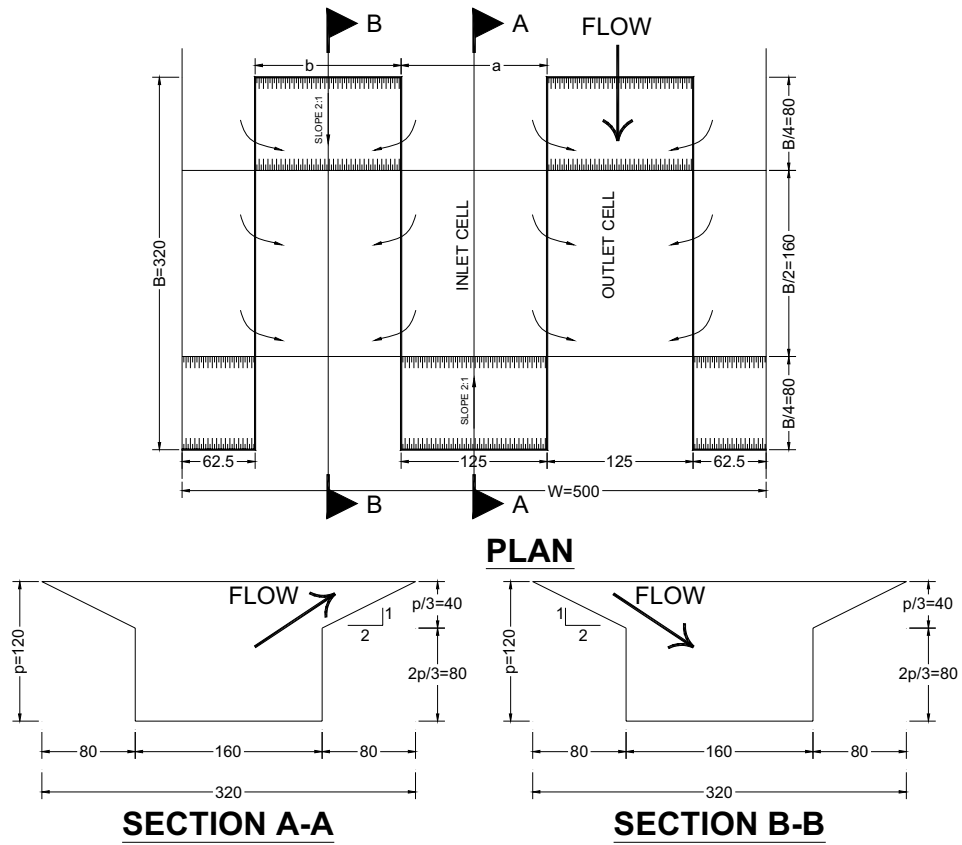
Plan and section of model P_1M_4 (dimensions in mm)
